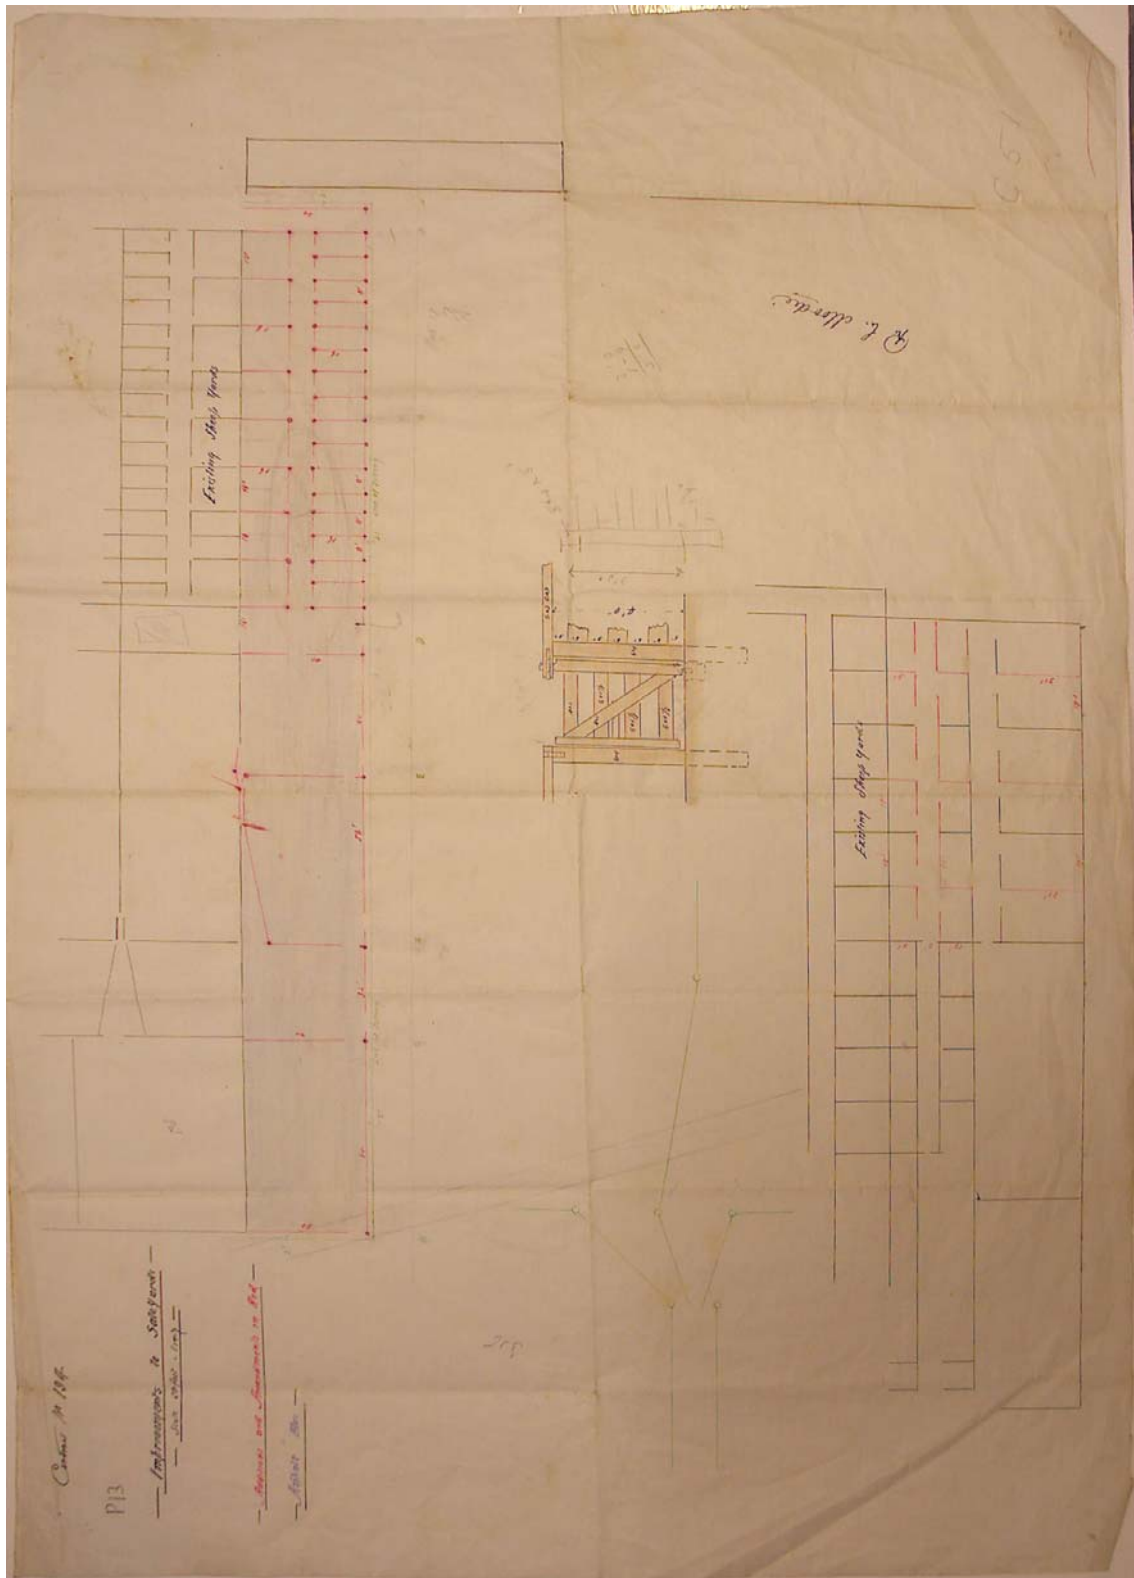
Plan showing proposed alterations & additions to the sheep yards, 1910. Source: Geelong Council Plans collection, P13, Geelong Heritage Centre.
